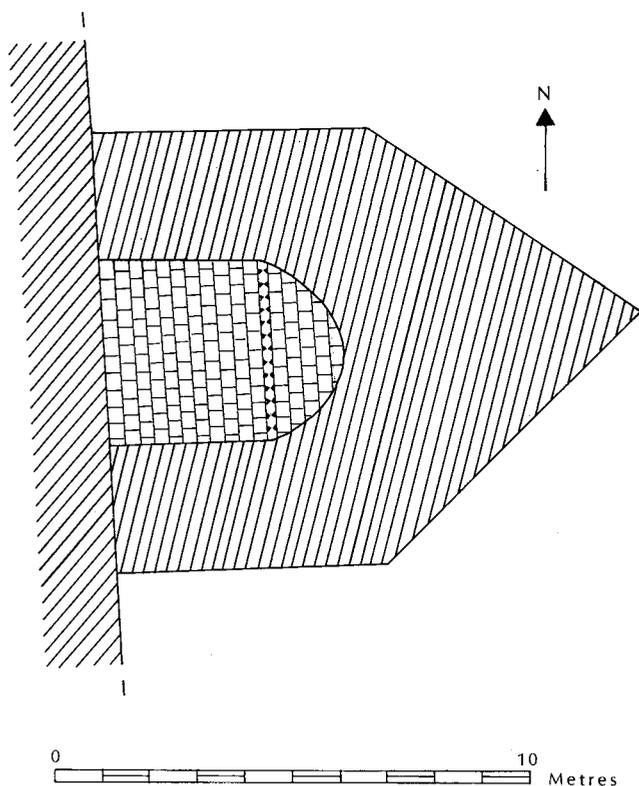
Area R. Reconstruction of the pentagonal tower's ground-plan.
